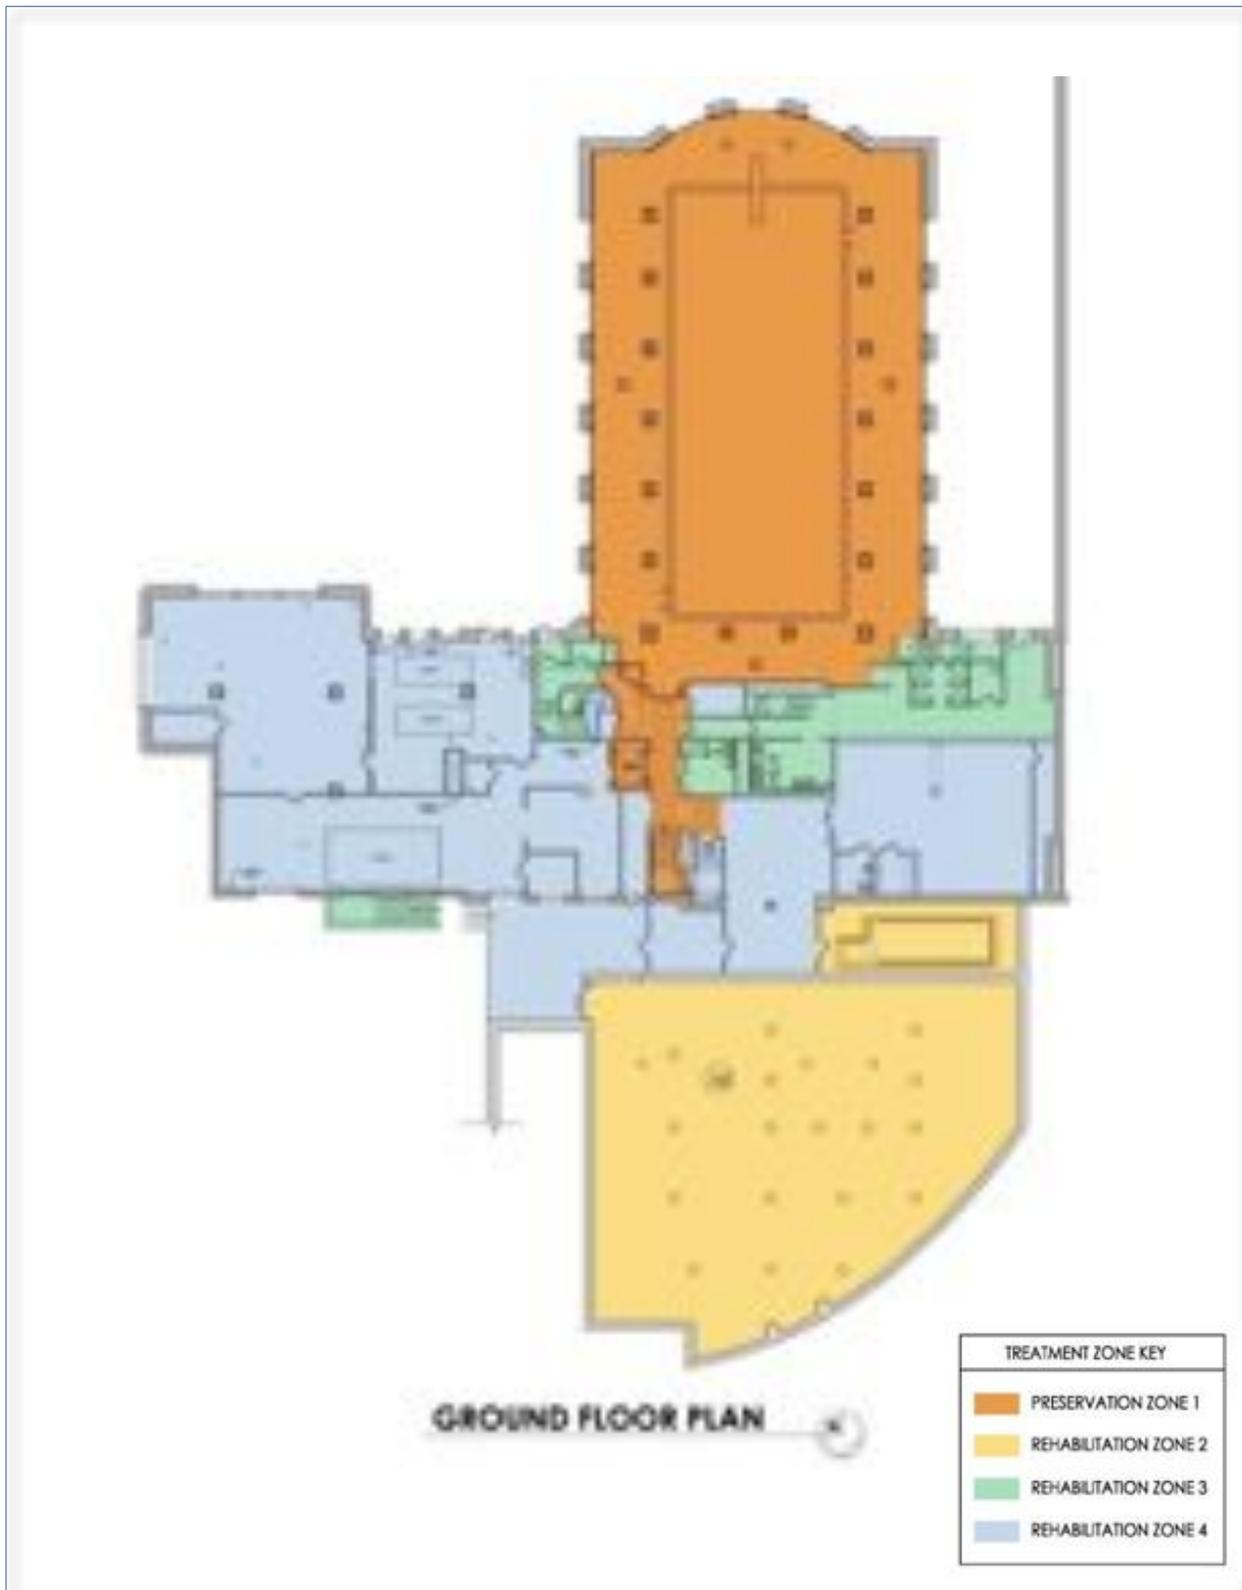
Preservation Treatment Zone Diagram – Ground Floor Plan (SRJA 2013)
